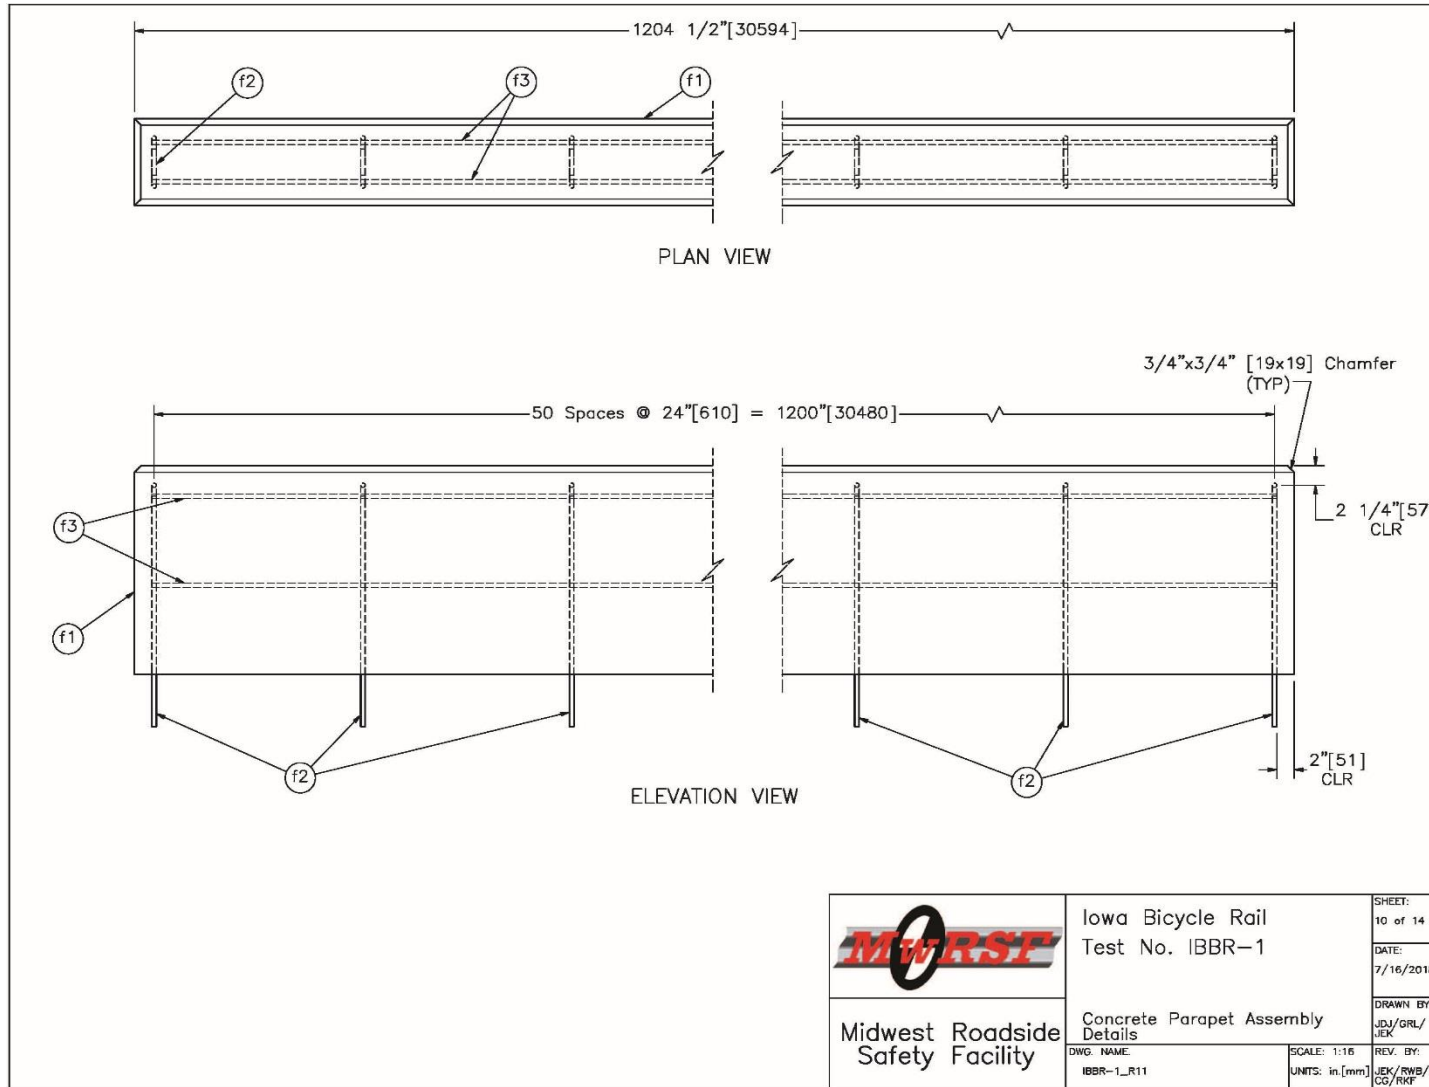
Iowa Bicycle Rail – Concrete Parapet Assembly Details
